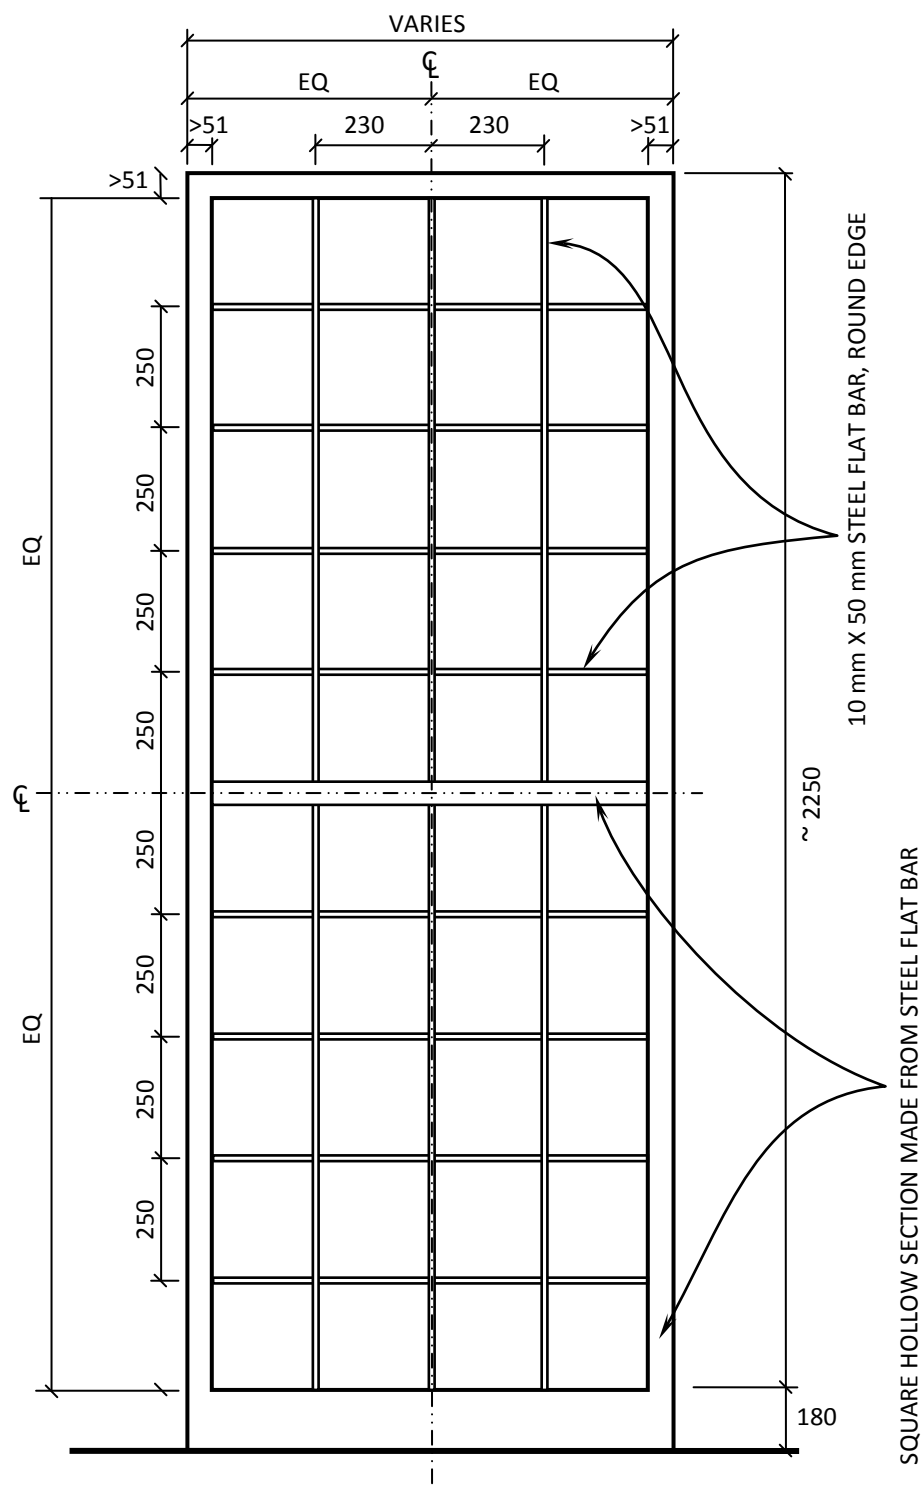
DOOR AND FIXED GRILLE ALTERNATIVE
